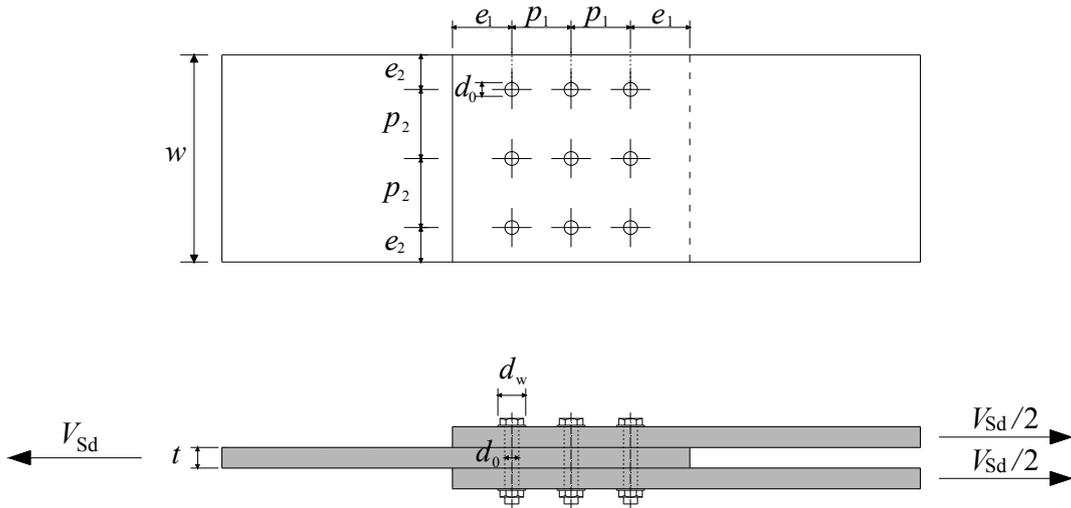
Bolted Lap Joint (symbols for spacing of fasteners): not staggered bolts.
